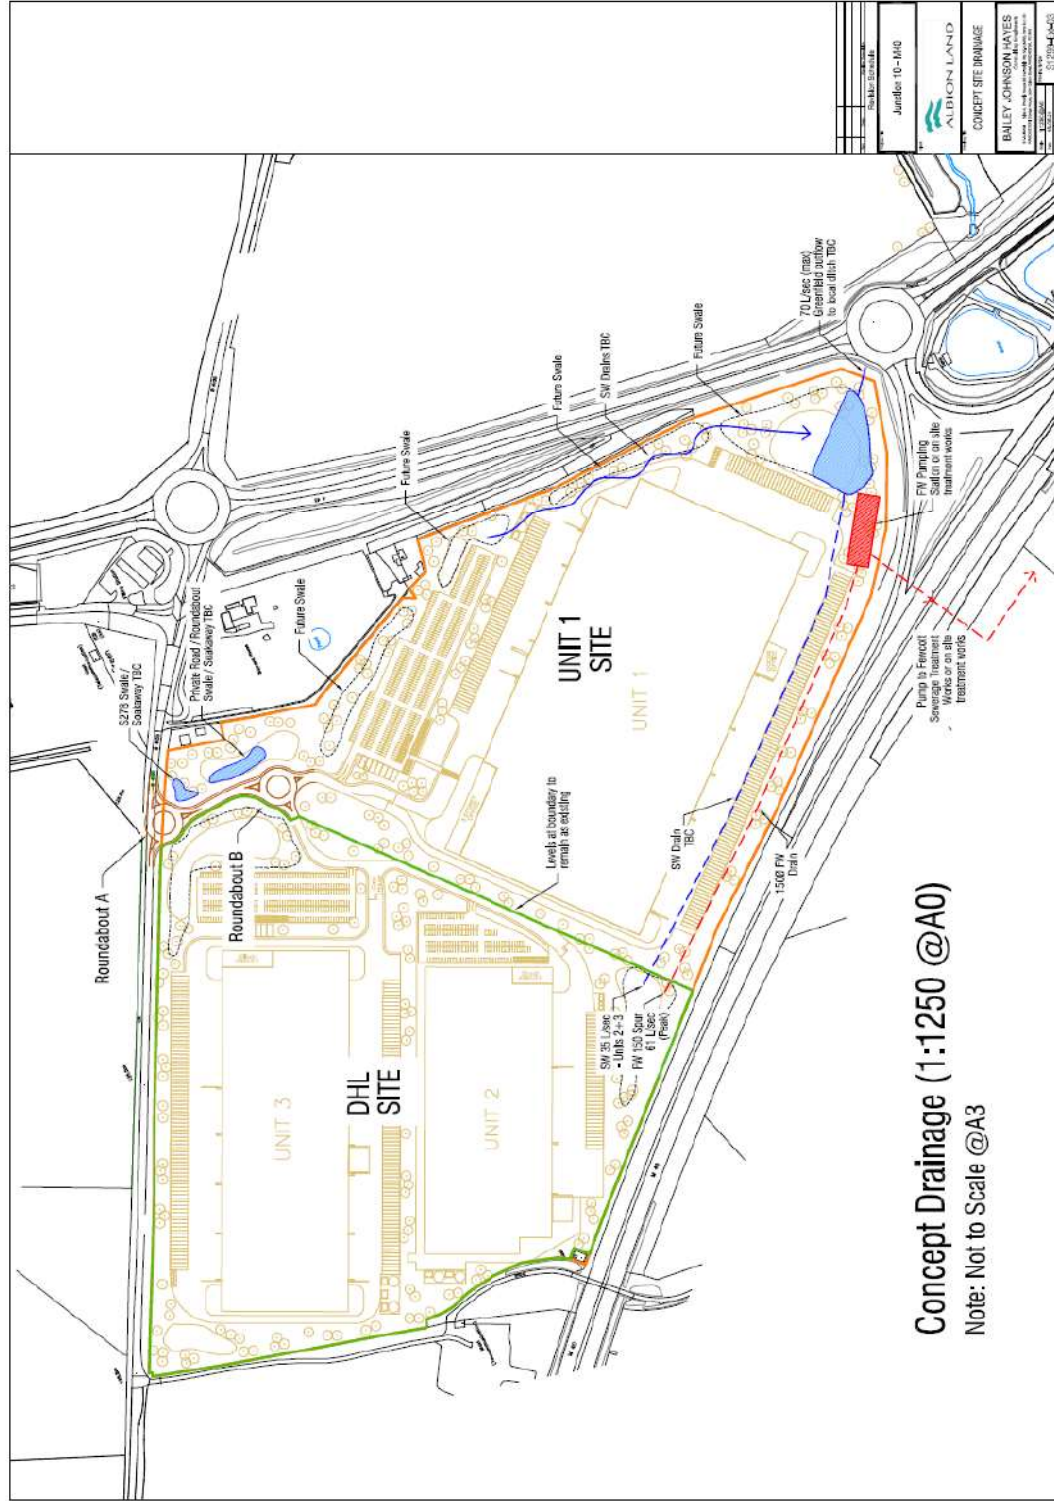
Indicative Boundary of Proposed Enabling Works and Enabling Works Site
